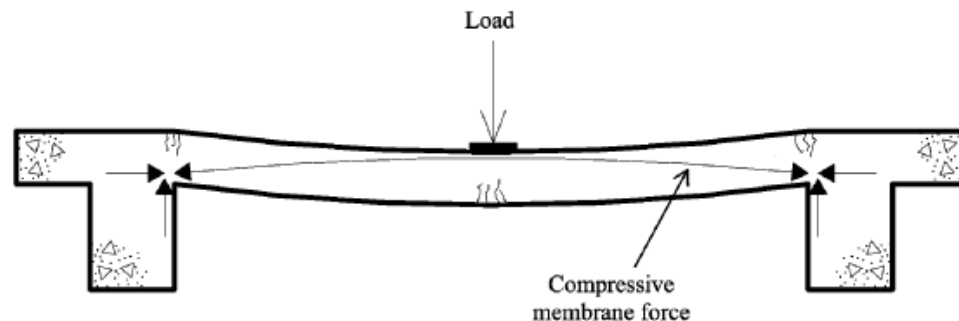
Compressive Membrane Action in Cross Section of Reinforced Concrete Beam-and-Slab Bridge Deck (Hon et al., 2005)
